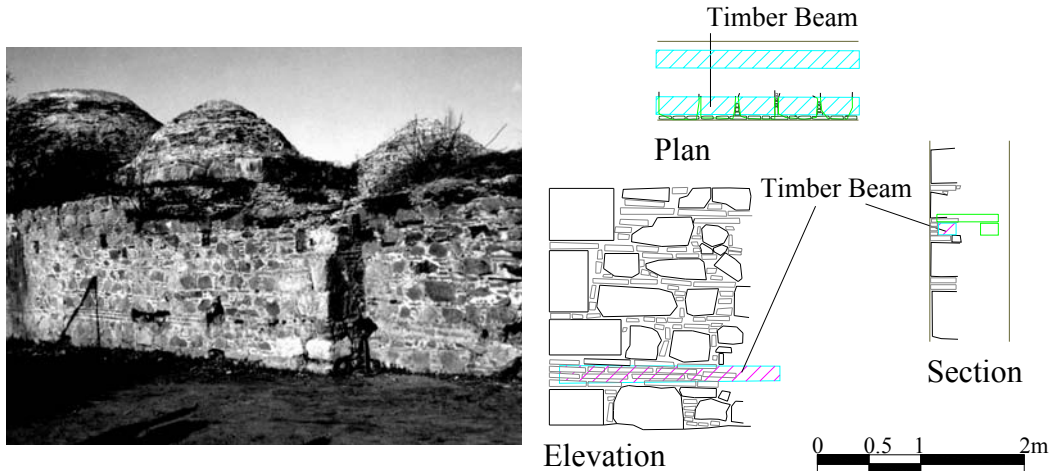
Düzce(Hereke) Hamamı, West elevation, Rubble stone-brick alternating bond
